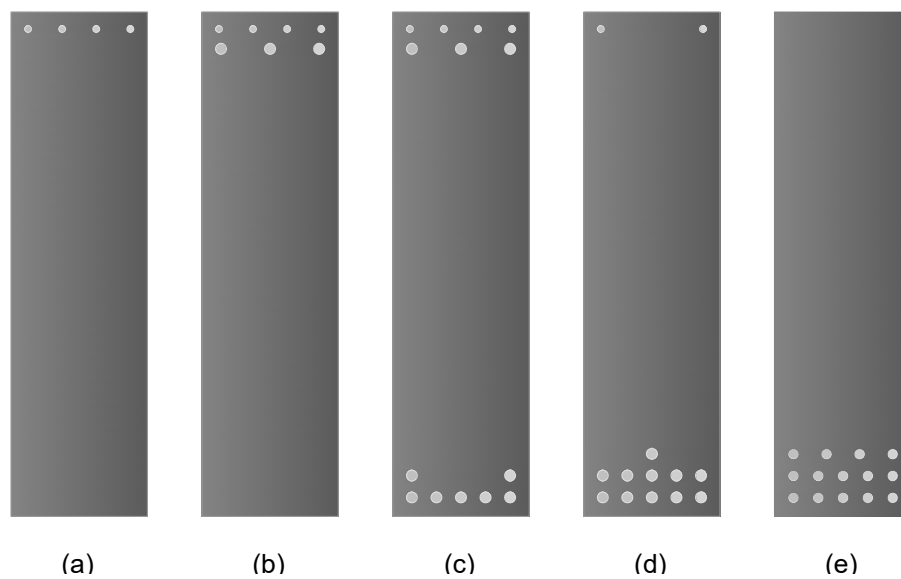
Beam's cross-section configuration: (a) Section 1, (b) Section 2, (c) Section 3, (d) Section 4, (e) Section 5
